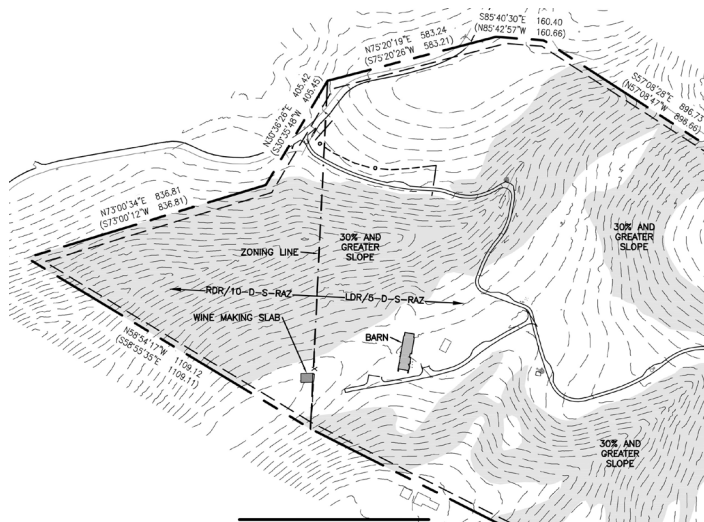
Site plan with zoning line and location of wine making pad and storage barn.
